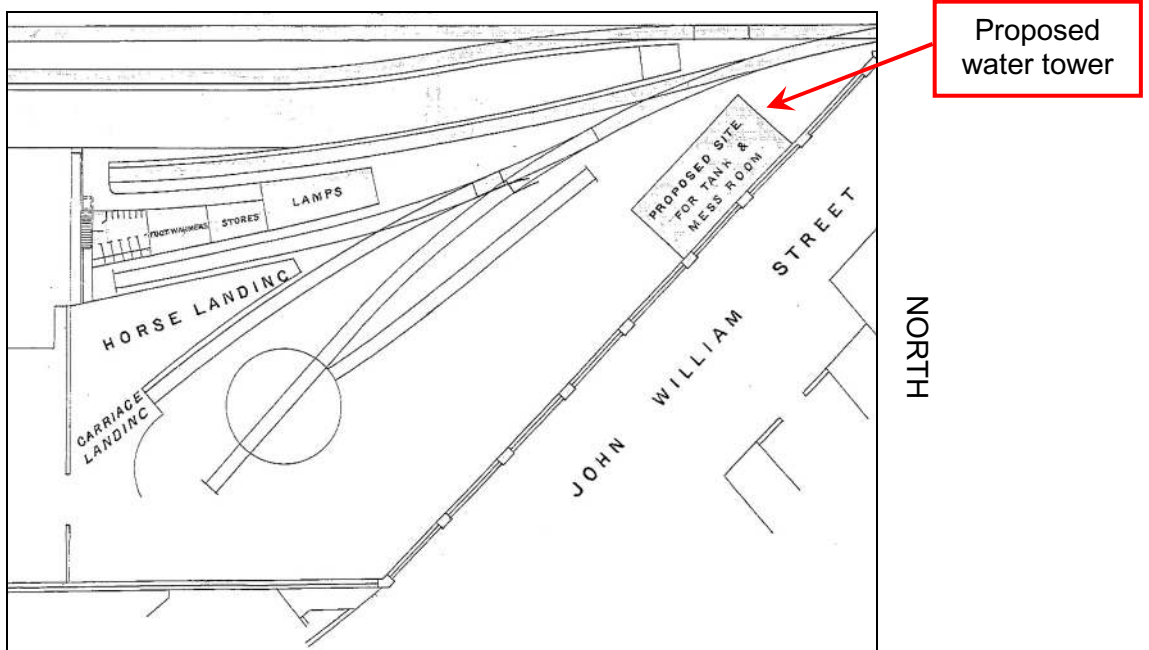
Extract from plan showing proposed enlargement of station (undated, c.1875)
